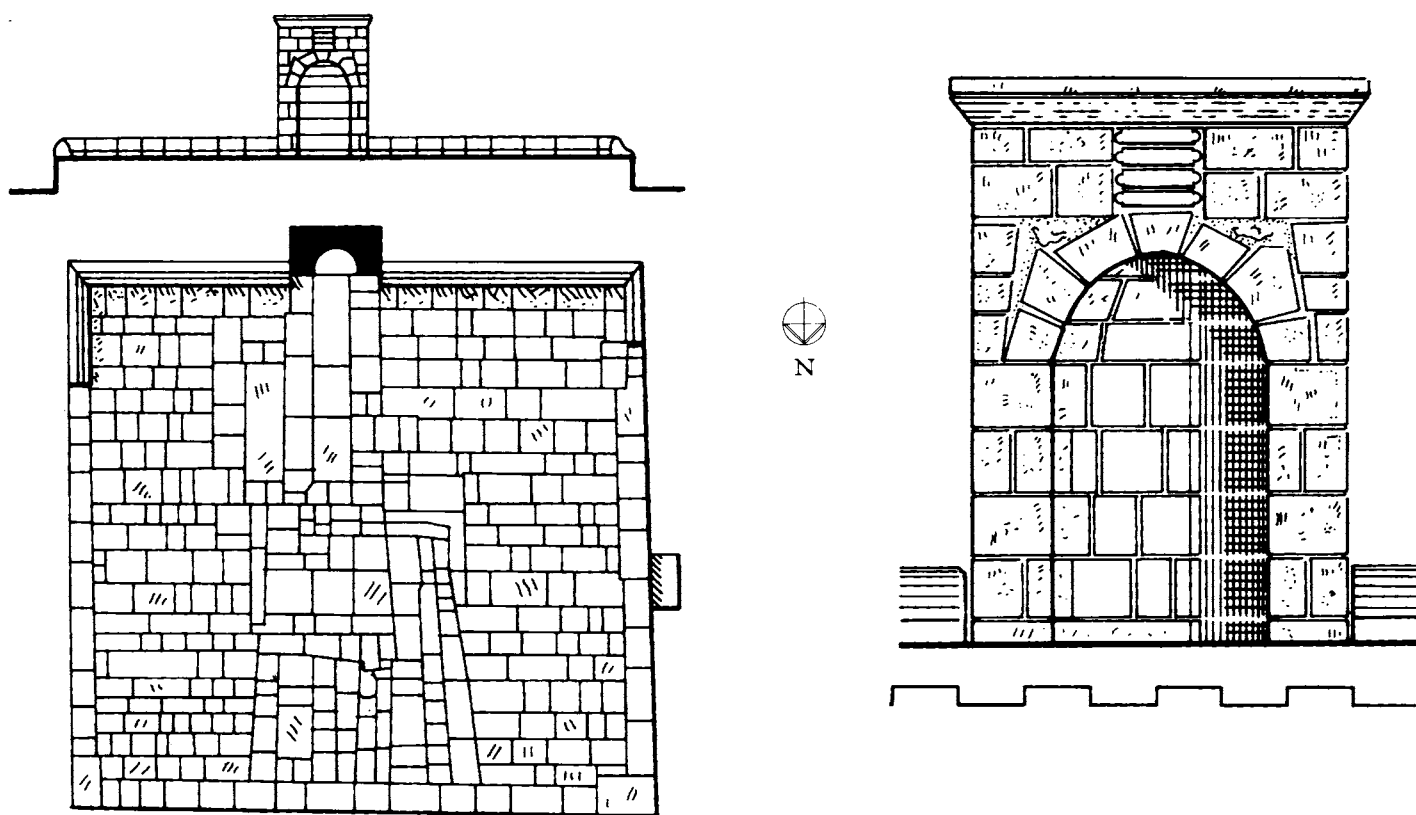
Musallat and Mihrab Ahmad Qullari (see cat. no. 47) elevation, section and ground plan.
